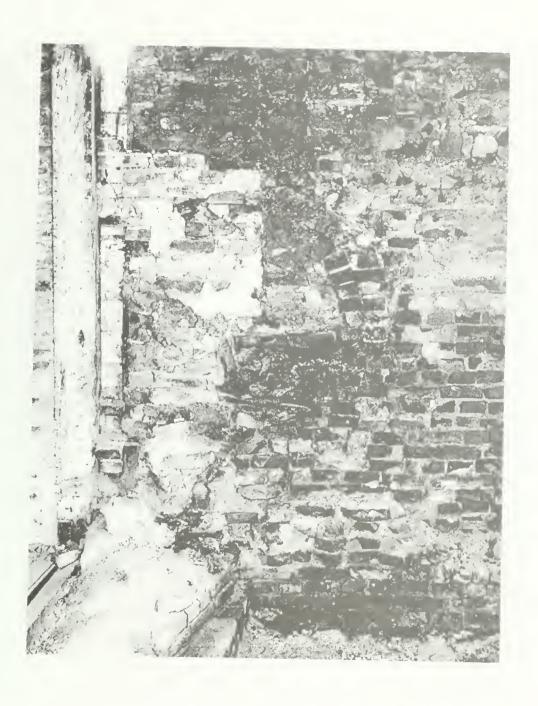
Schuyler House: First story of kitchen wing, east wall after post-1780 fireplace removed (1958); detail shows evidence of bake oven.
